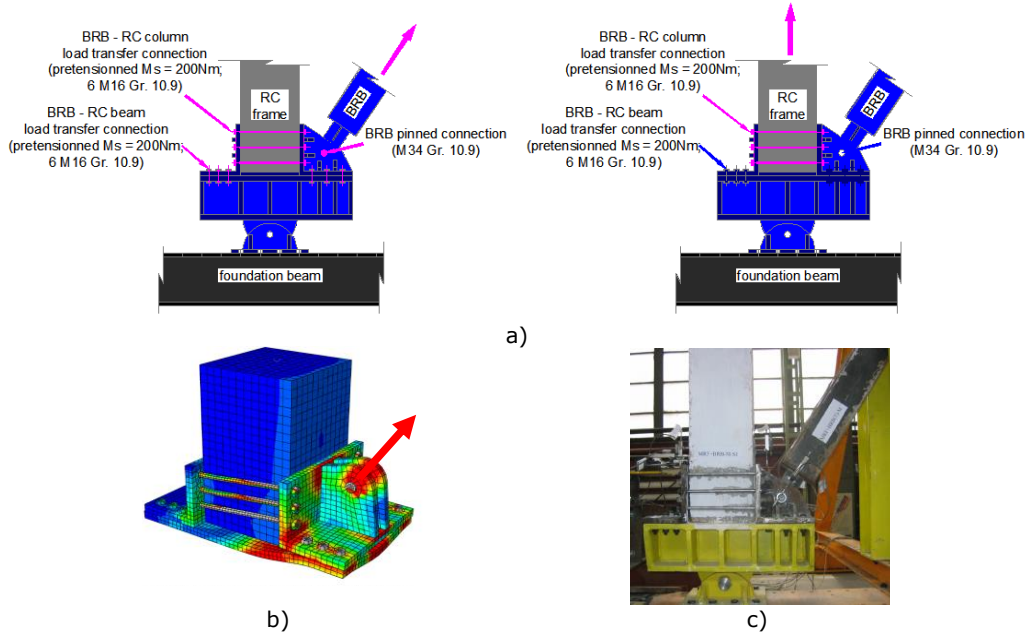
Column base and BRB to column connections: a) BRB and RC column; c) FEM modeling; d) detail of the BRB - RC connection
